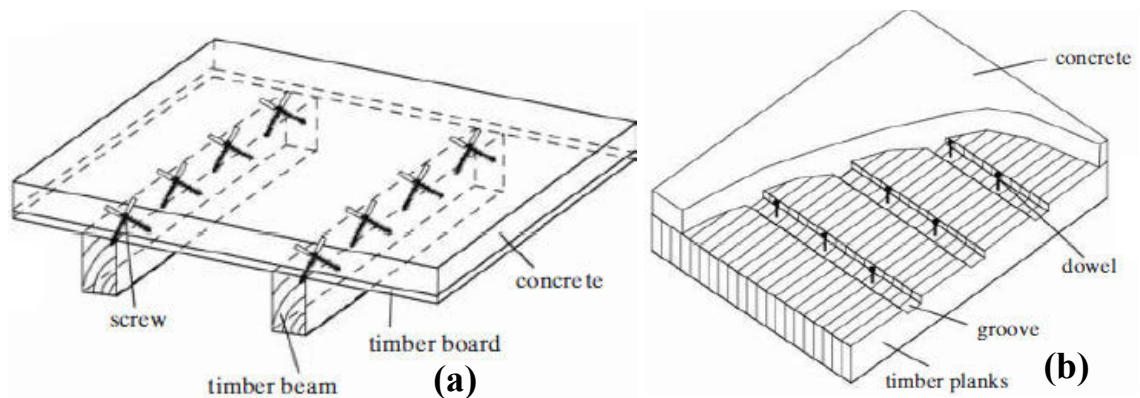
(a) Beam type floor and (b) slab type floor (Frangi et al. 2003)
